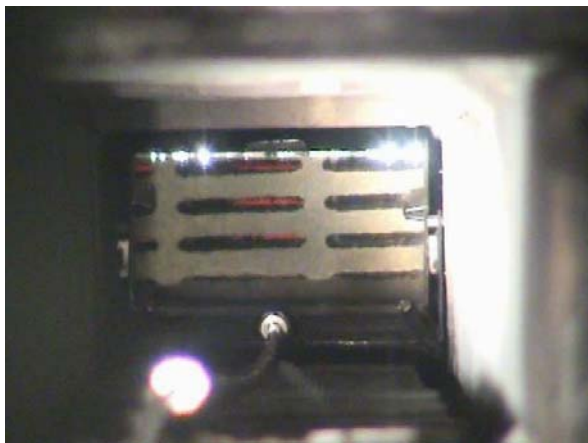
Photographs of regenerator brickwork inspection with the Prototype 2 inspection/cleaning system without operation of the cleaning equipment (camcorder: visual mode)
